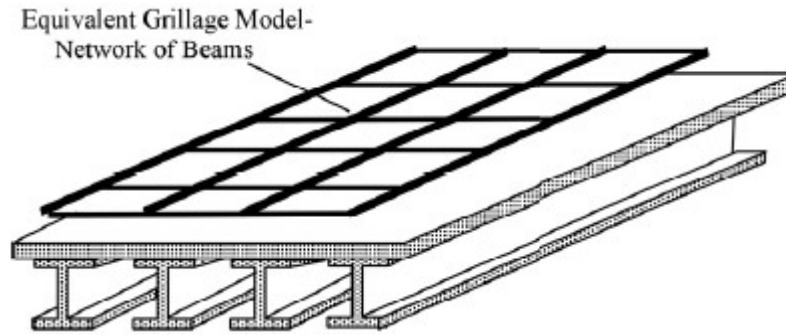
Grillage System for Slab-on-Girder Bridge
